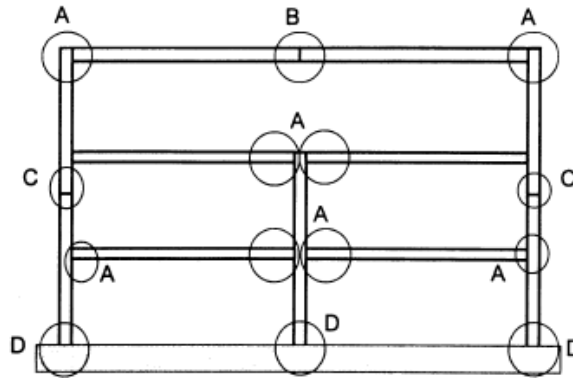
Different types of connections in a building [Ivanyi et al 2000].
